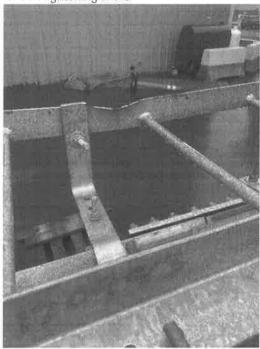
(5/10/22) – Damage to one of the ladder sections.
